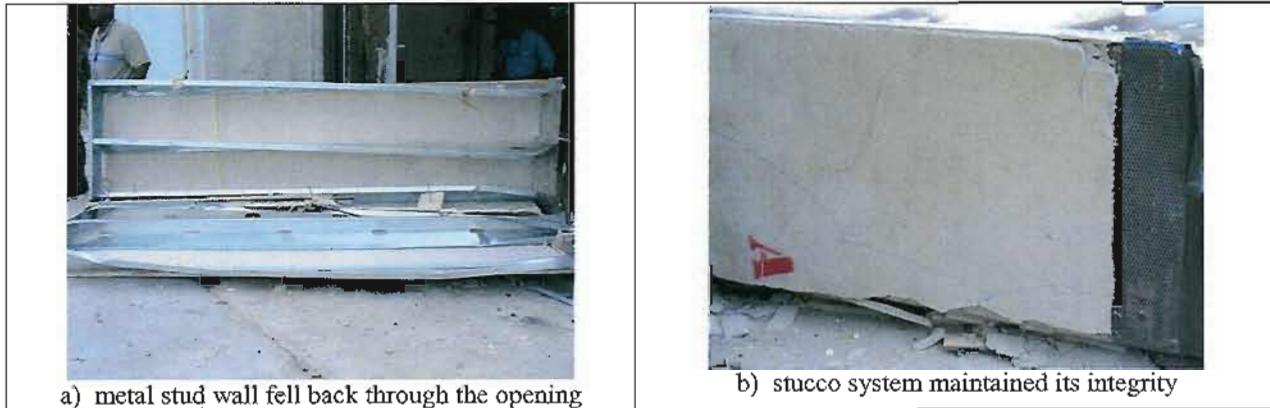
Picture of Metal Stud Wall Immediately after Test 2
